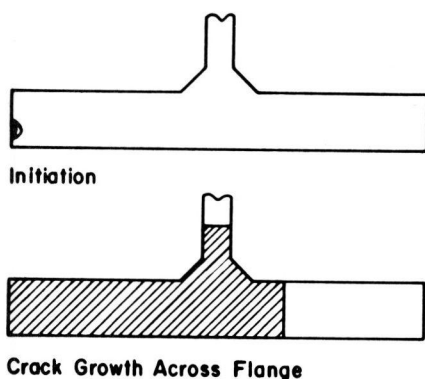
Crack initiation and growth in groove welds (Type 2 failures).
